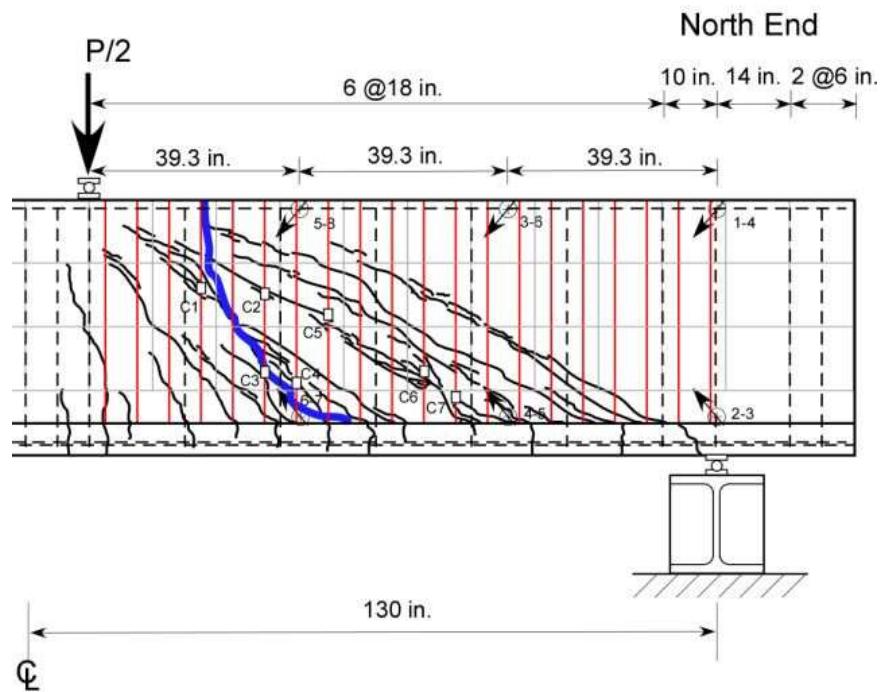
Specimen IT.7.18.6.M crack map (failure test)
